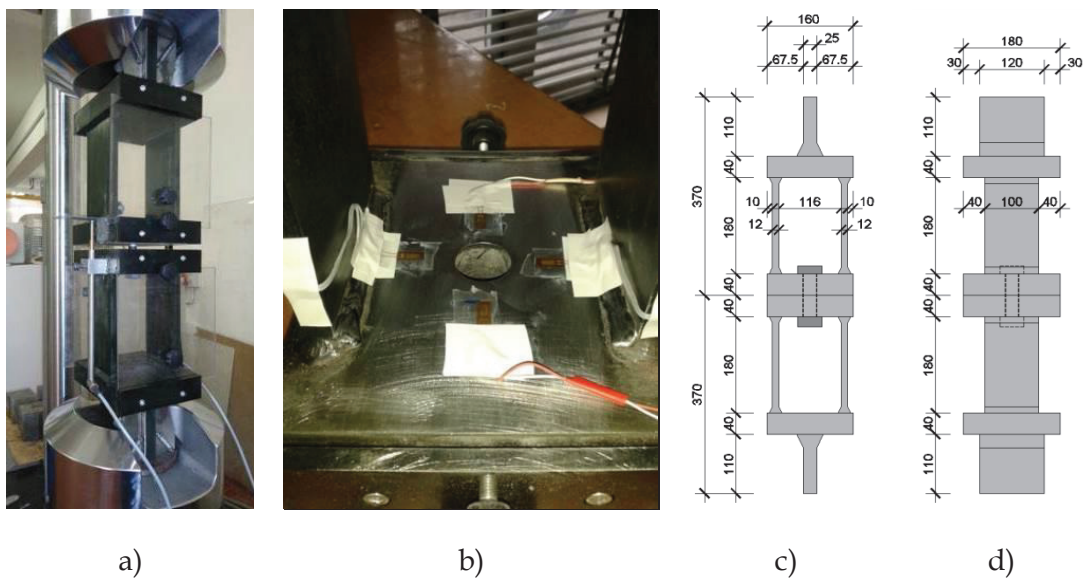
Experimental test set up: a) steel casings with installed LVDTs; b) 40 mm thick plates with strain gages; c) dimensions - front view; d) dimensions - side view
